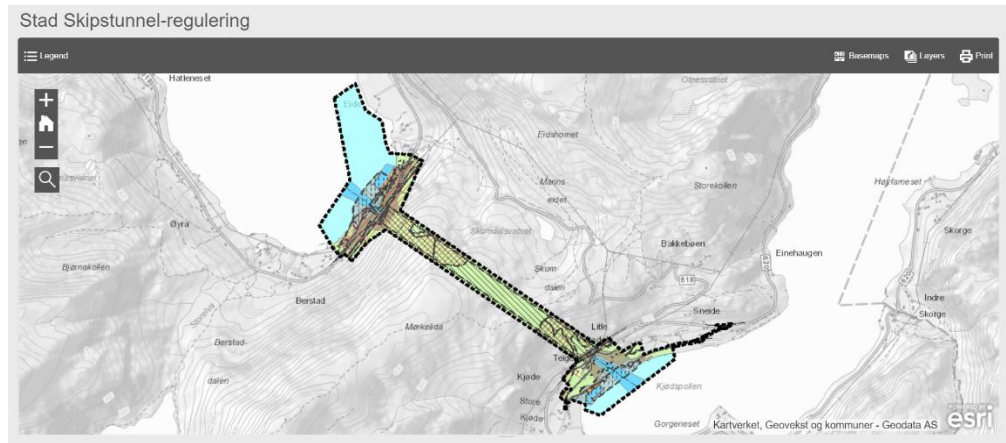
Planned tunnel design (Asplan Viak, 2017)
